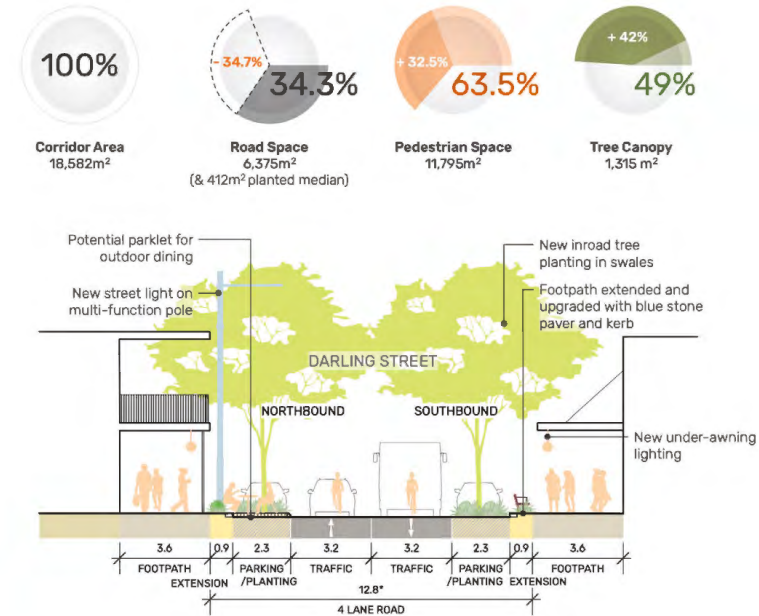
Darling Street Section (1:200) - Typical Proposed Configuration
